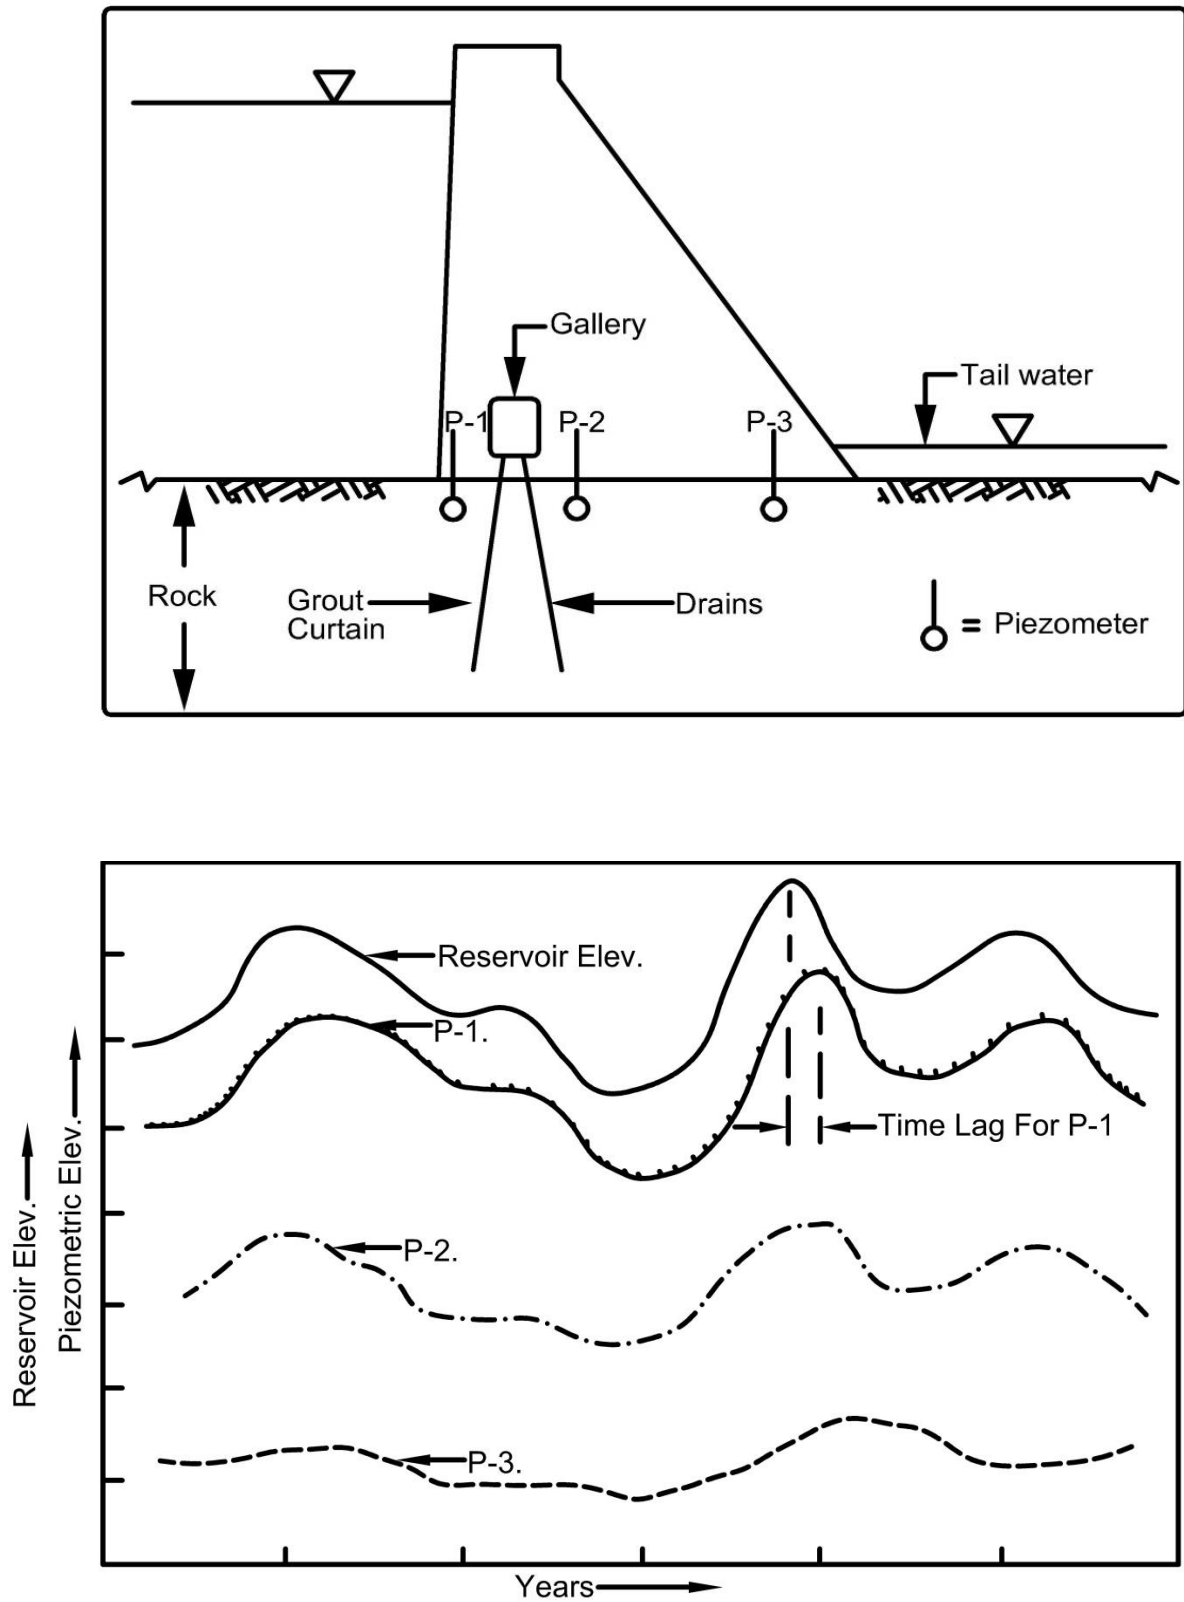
Plot of seepage v/s reservoir elevation for a concrete dam
